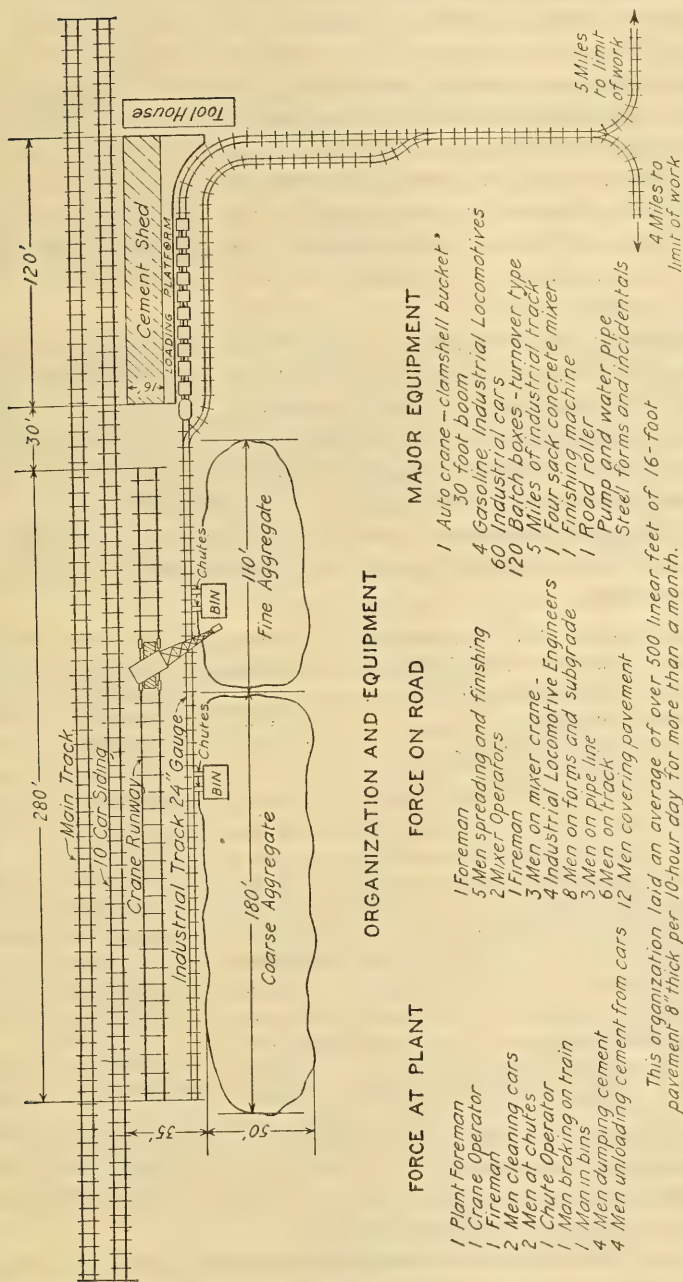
Typical organization and plant layout, central proportioning, open bin loading, industrial haul.
